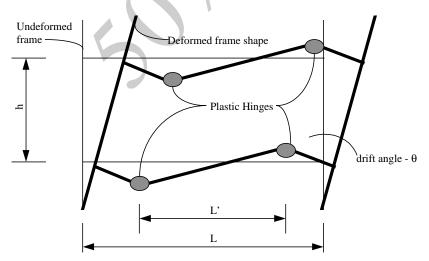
Inelastic Behavior of Frames with Hinges in Beam Span
